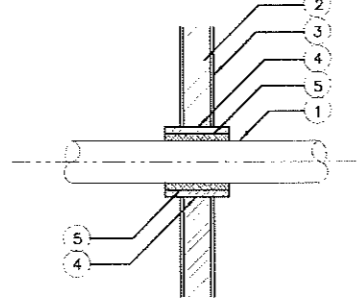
DETAIL SLEEVE THRU. FLOOR 2 (CLOSING)
